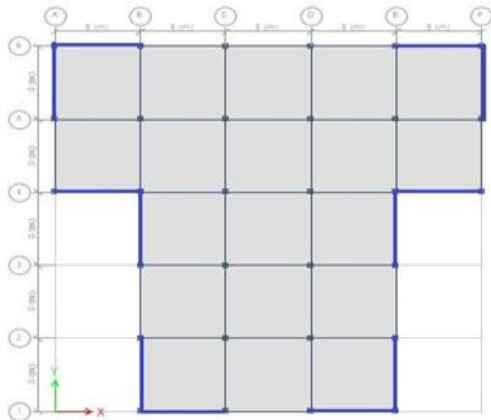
Top view of braced models (darken part shows location bracings are placed)
